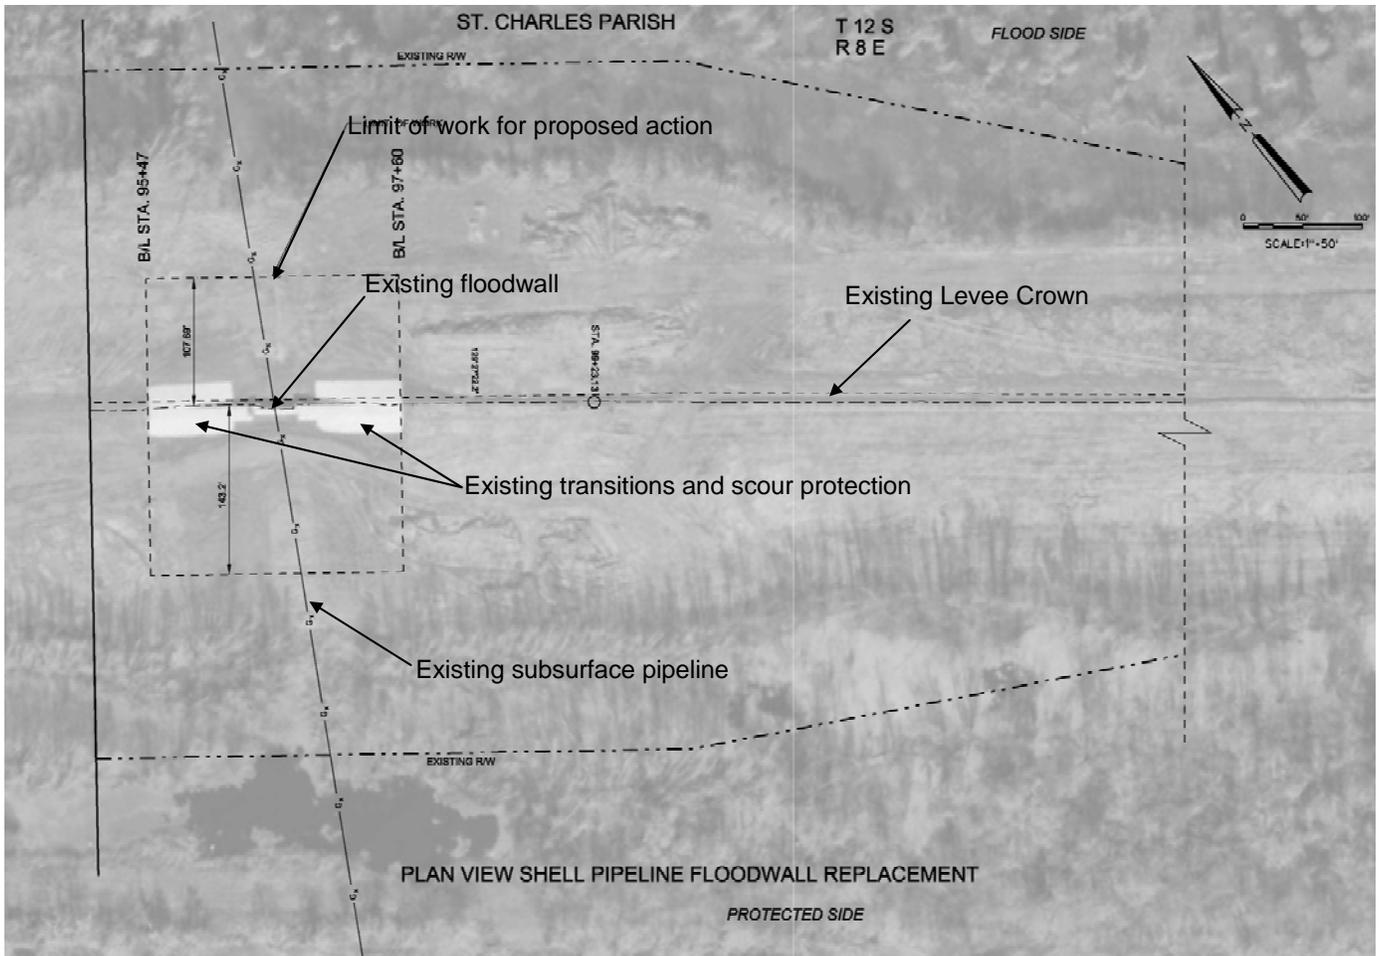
Plan view of the earthen levee segment to replace the Shell Pipeline floodwall.
